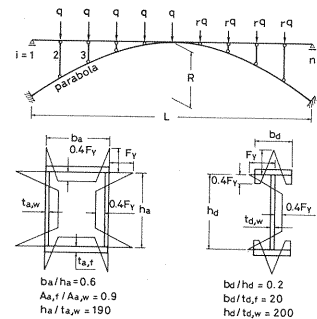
Reference Bridge Model (arch geometry, loading and cross sections).
